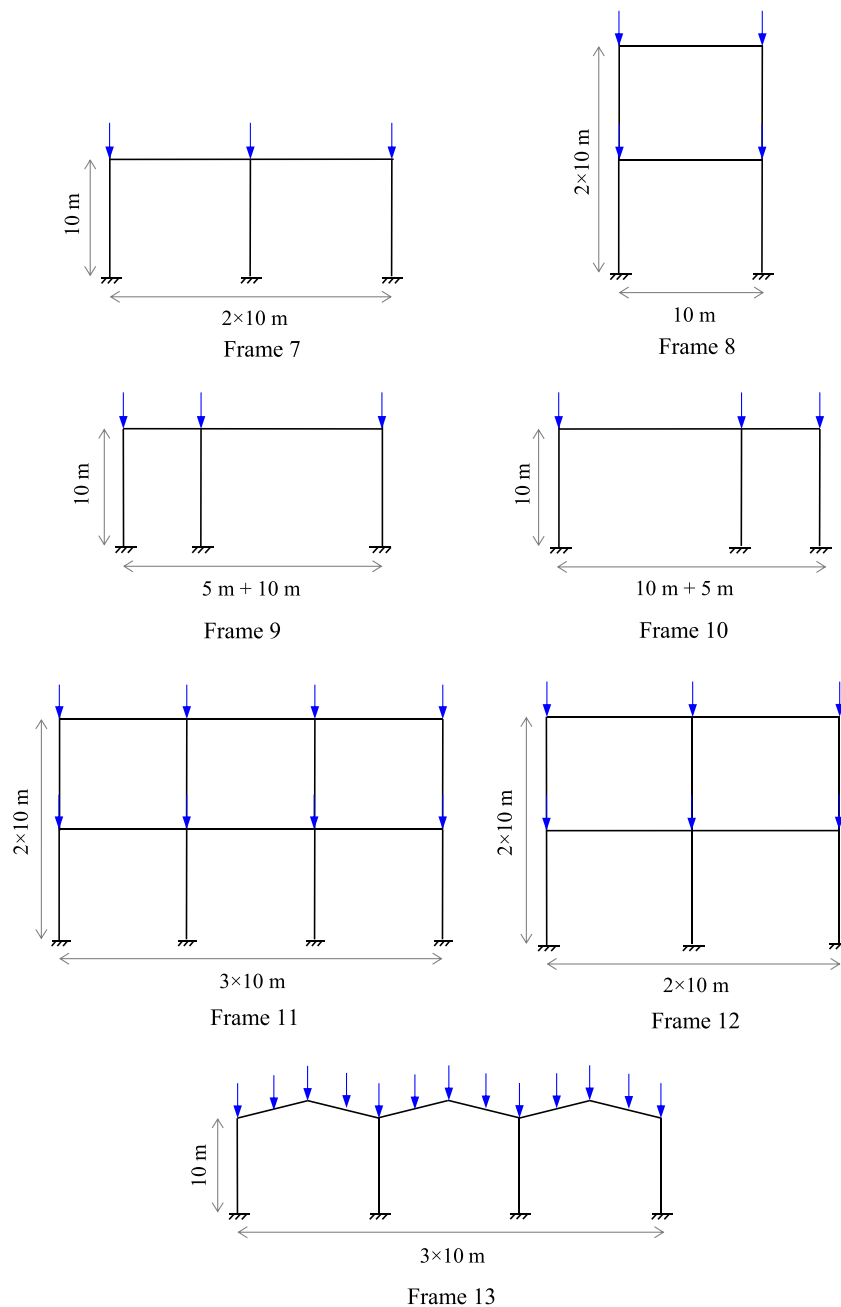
Multi-storey and multi-bay frame layouts considered in the study (adapted from [25,26]).
